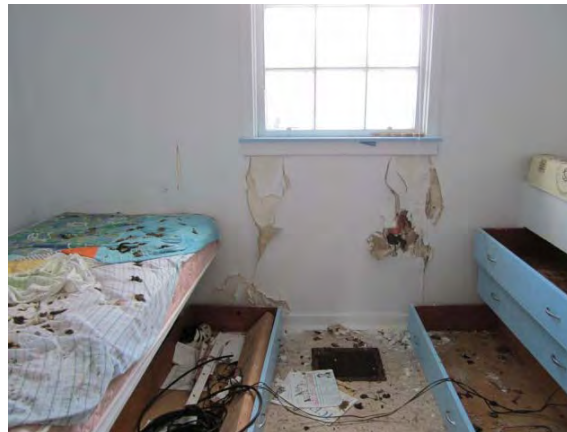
View of room 3 in dwelling. Note: bird or animal feces.
